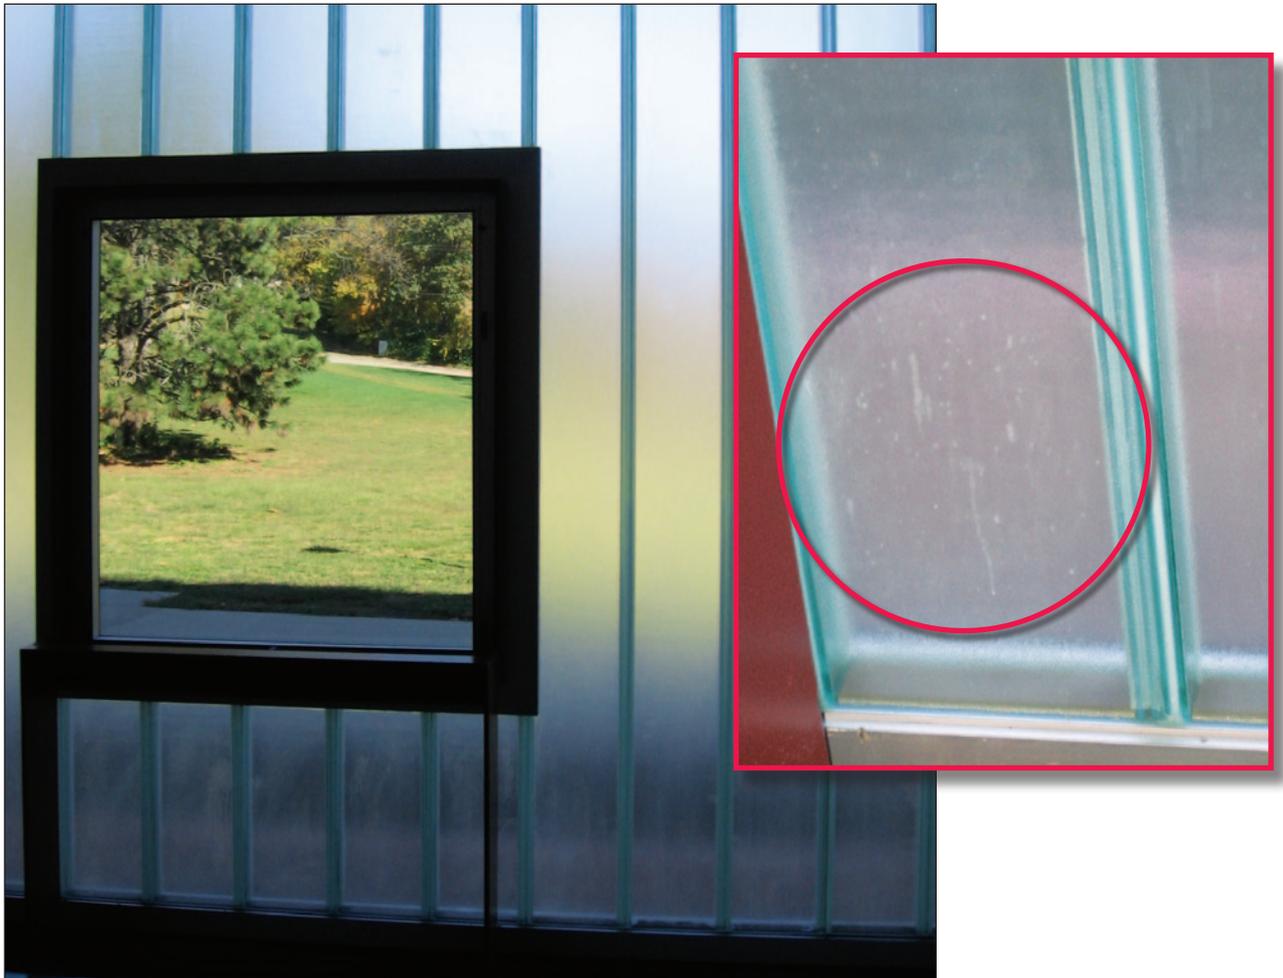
Double glass panels trapped river water between panes in structural glass walls at the Art Building West (Iowa City, Iowa).
